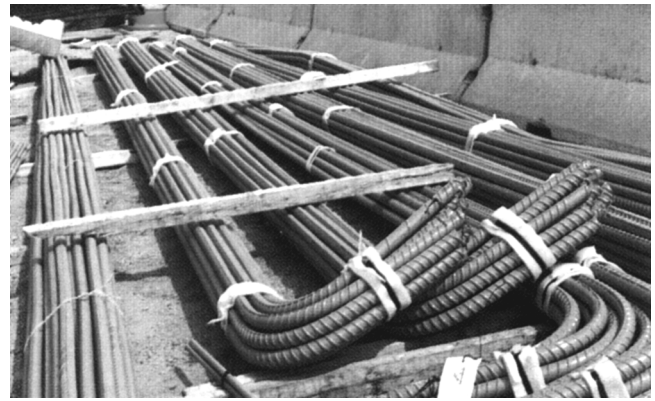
Epoxy-coated reinforcing bar (courtesy of Concrete Reinforcing Steel Institute).
